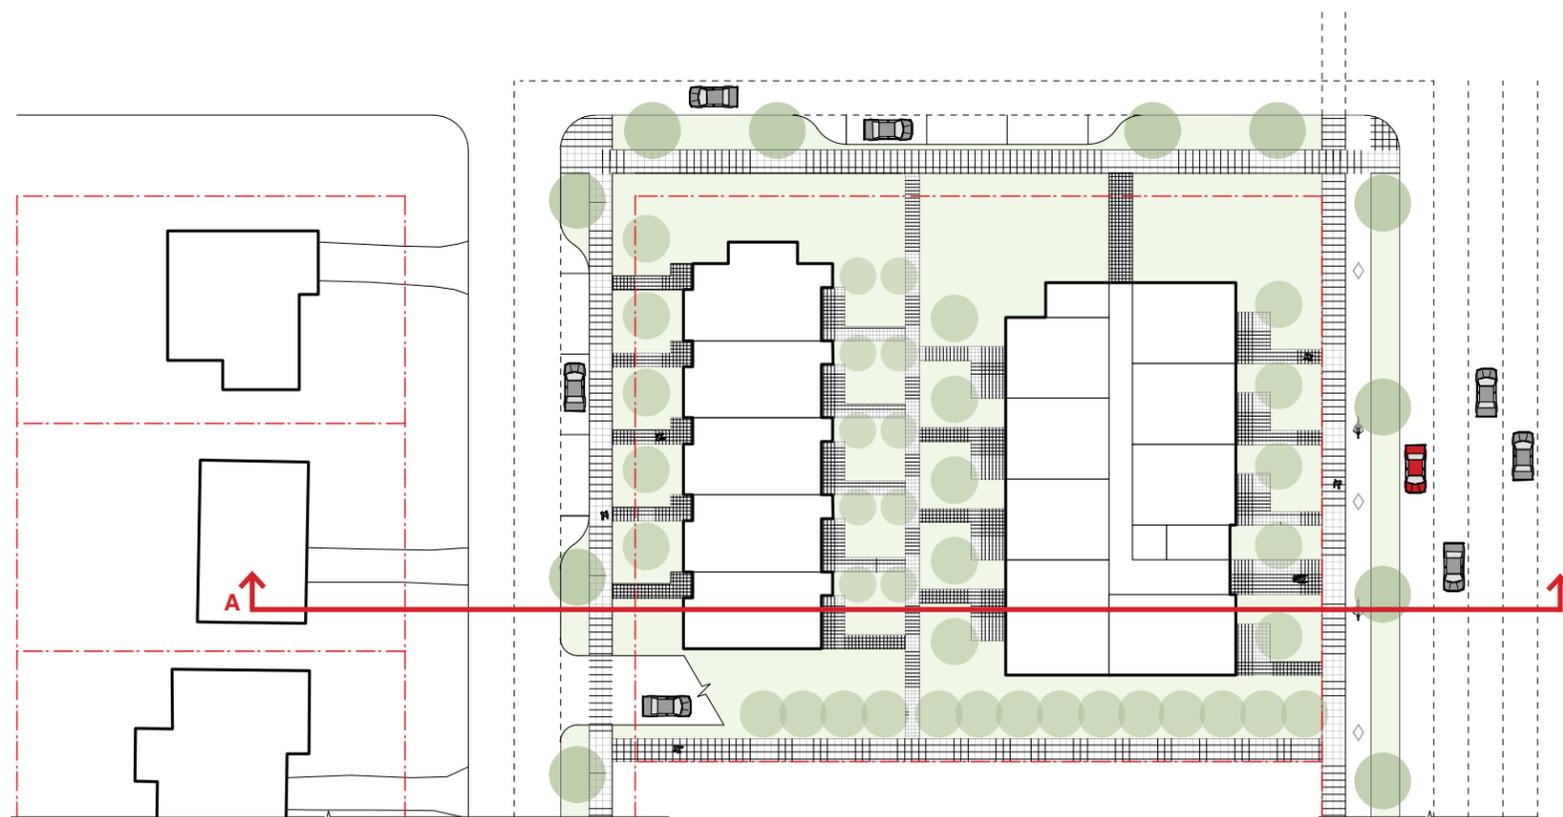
SAMPLE SITE PLAN (not to scale)
